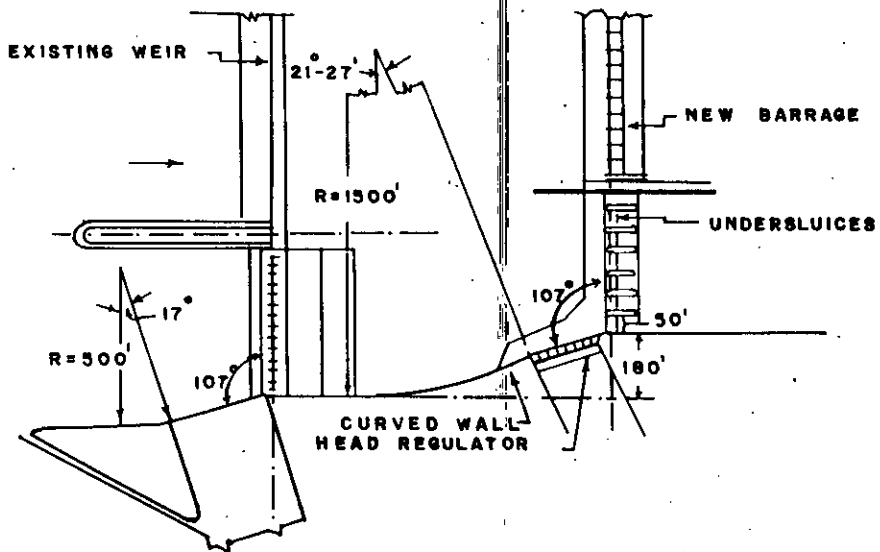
LAYOUT OF CURVED WALL AT NARORA BARRAGE (U.P)
